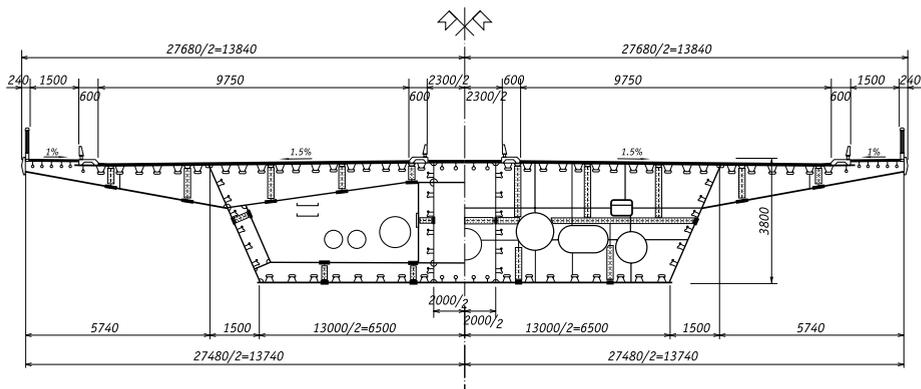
The “Sloboda” roadway bridge over the River Danube in Novi Sad – cross section
